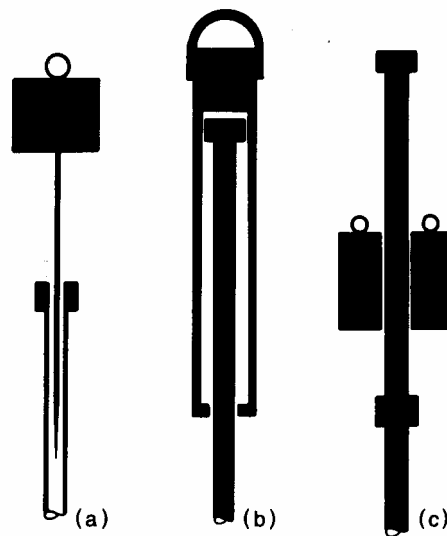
Sections through American SPT slip-rope hammers: (a) pinweight hammer; (b) safety hammer; (c) donut hammer (after Riggs 1986).
